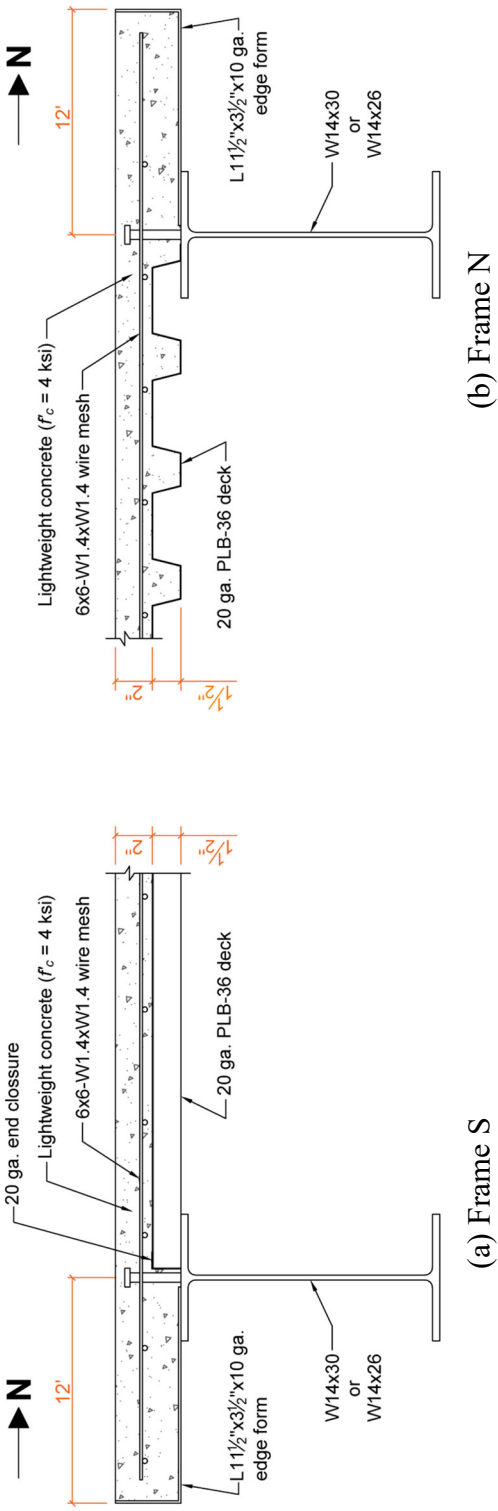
Phase 1 Test Building: Composite Cross Sections of Collectors
